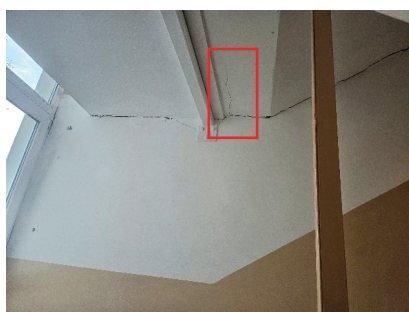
Crack in the staircase landing between the ground floor and the first floor, as of August 2025
